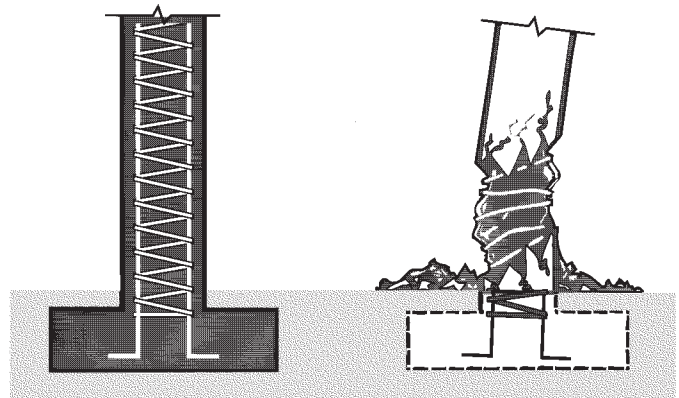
Lack of Reinforcing steel. If the confining reinforcing steel in a column is too widely spaced (a), it will not be able to keep the vertical reinforcing bars and the concrete in place when it is shaken by an earthquake (b).
